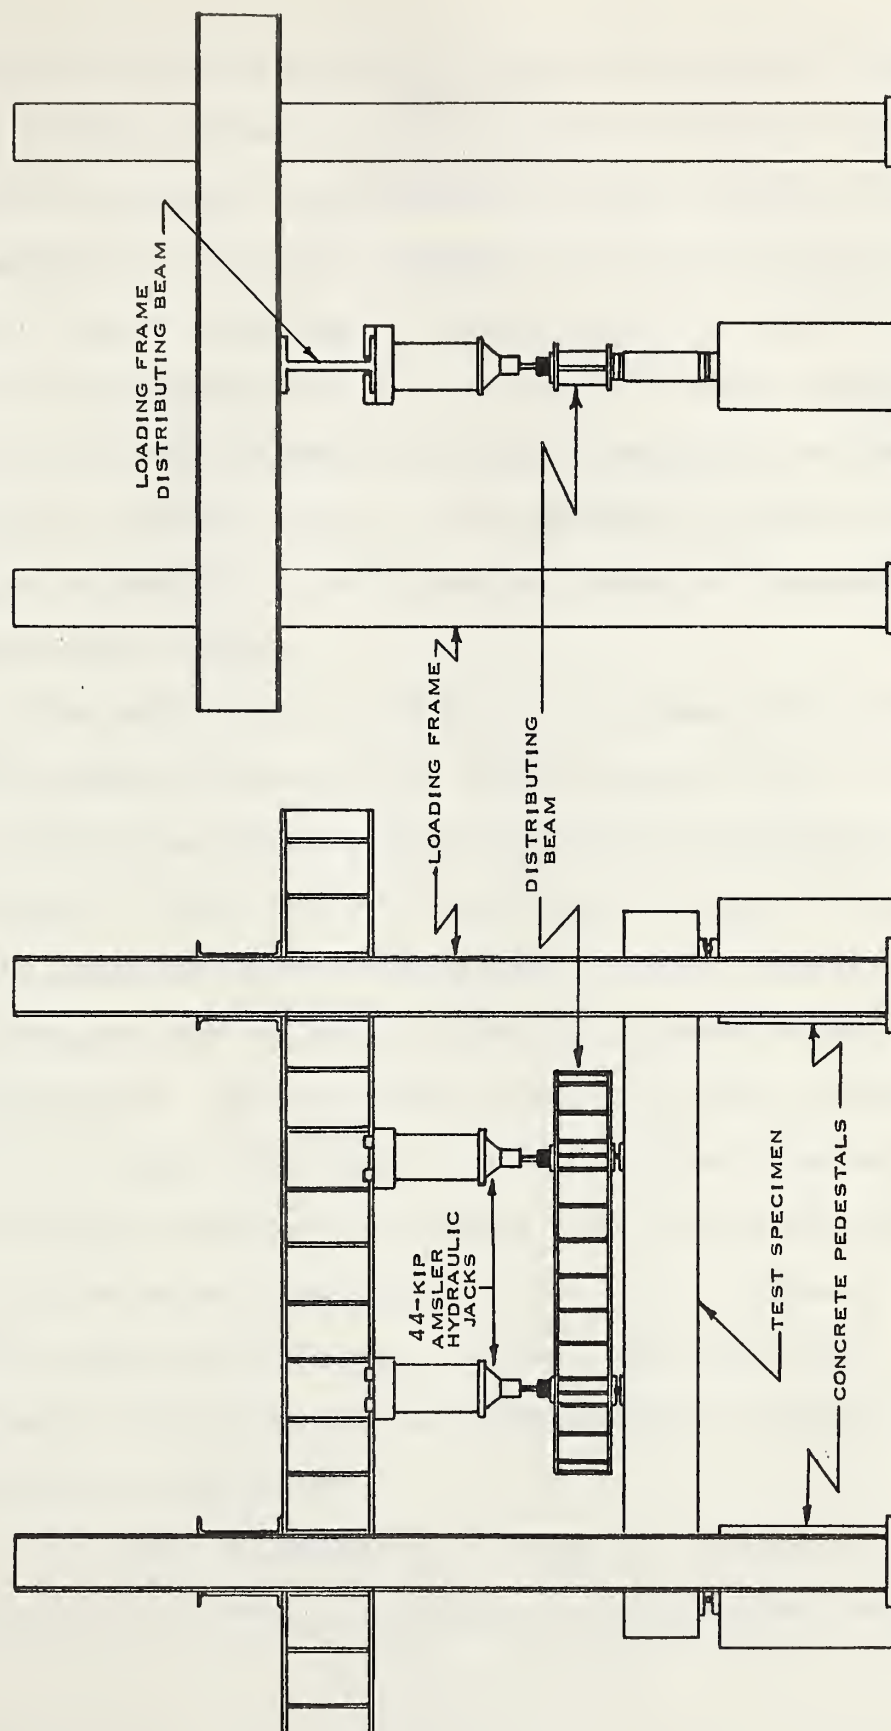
LOADING FRAME ARRANGEMENT
